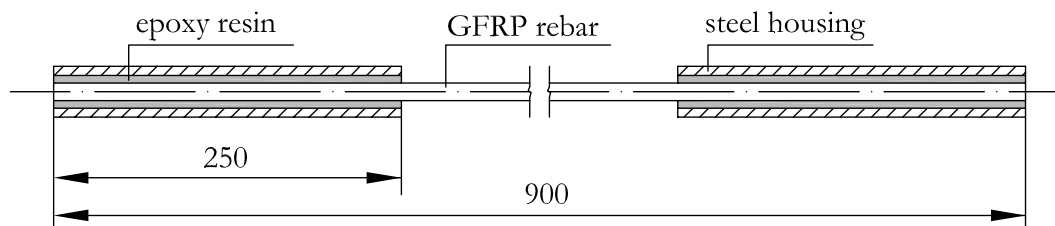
Sketch of rebar tensile test specimen (units in mm).
